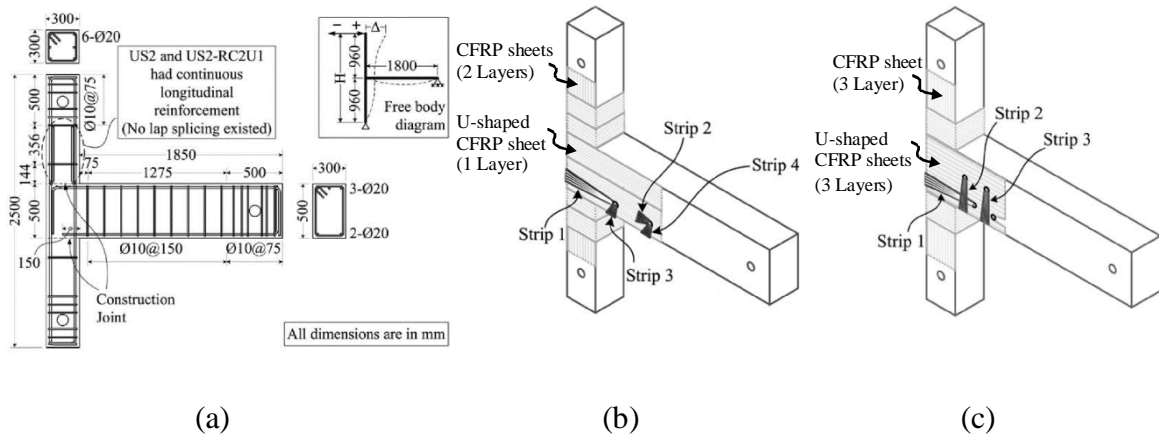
Experimental investigation on retrofitting of exterior beam-column joints by Parvin et al. [100], (a) specimen details and test configuration, (b) proposed CFRP scheme RC2U1, and (c) CFRP scheme RC3U3
